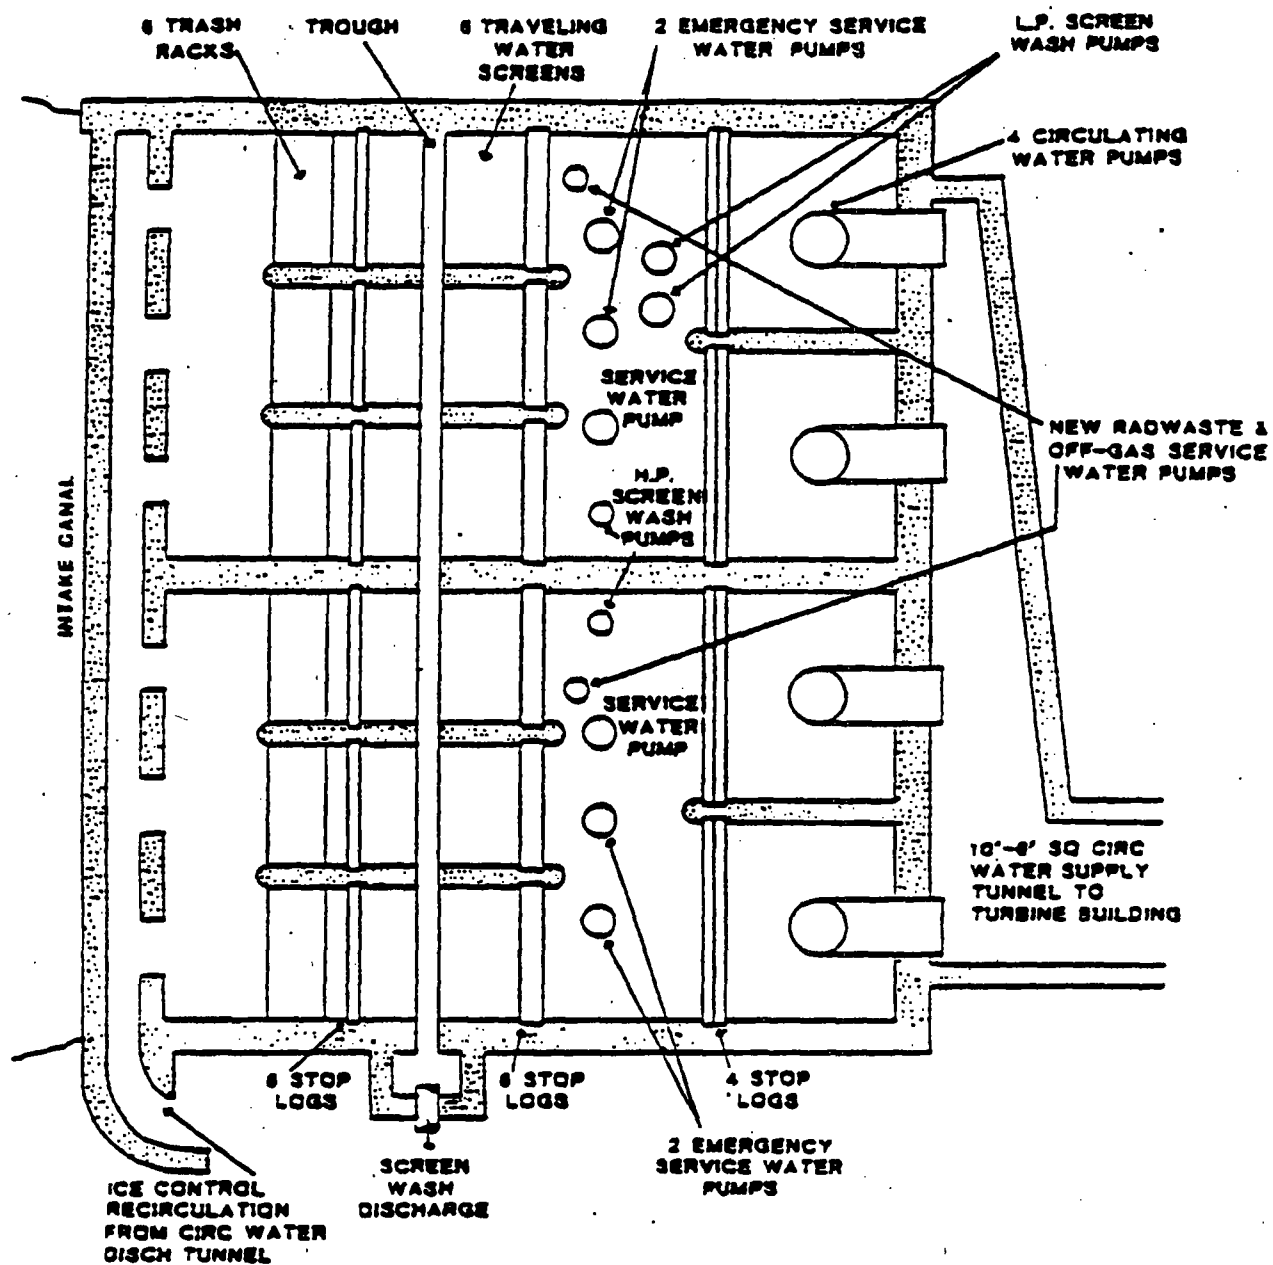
OCNCS Circulating Water System Intake Structure in plan view.
